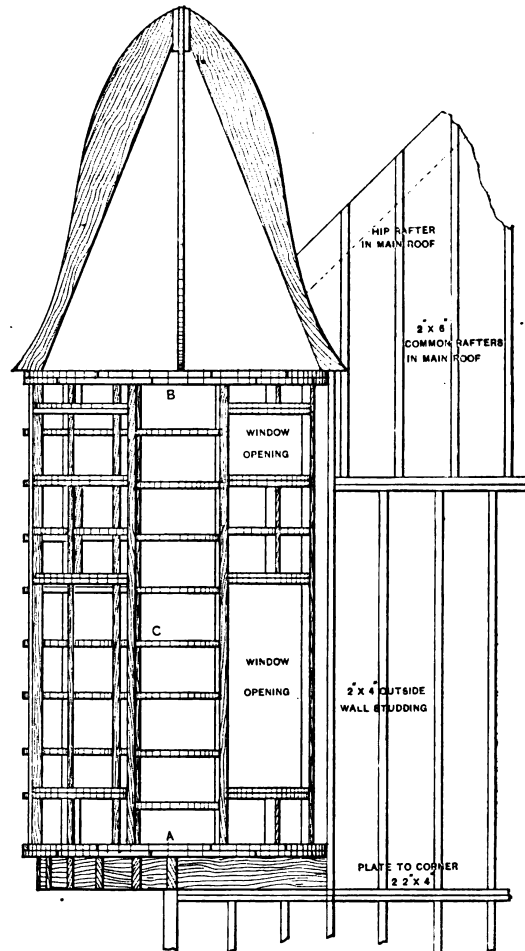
Elevation of Tower Framing.—Scale,  $\frac{1}{4}$  Inch to the Foot.
